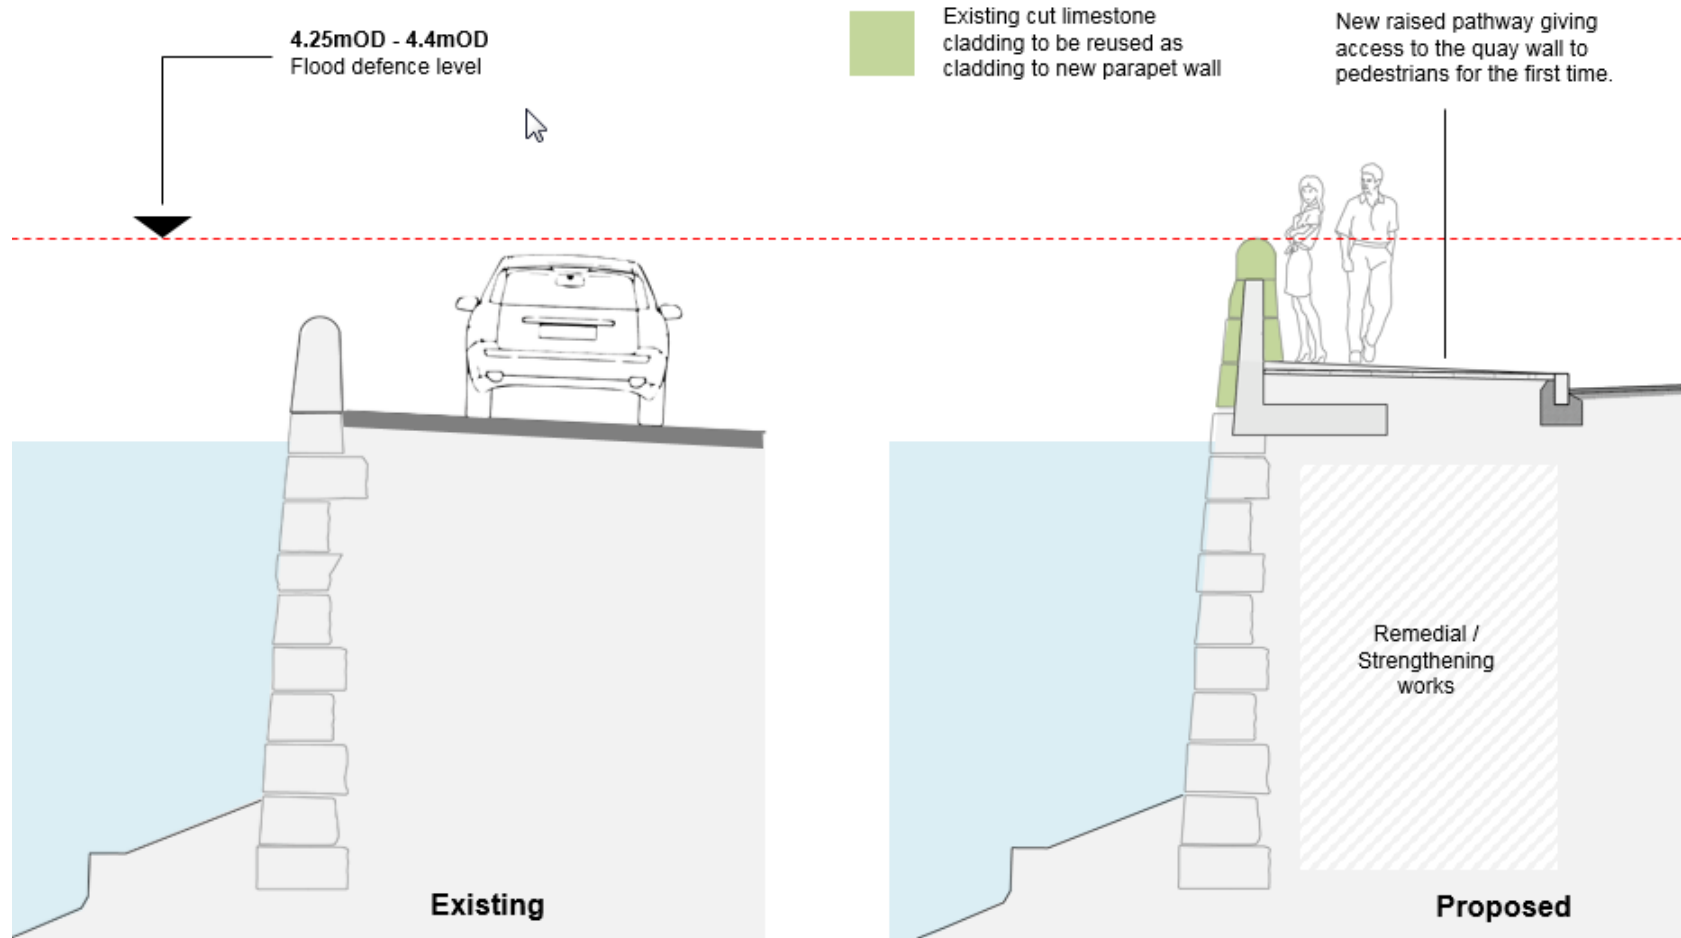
Existing and Proposed cross sectional views at Bachelors Quay
